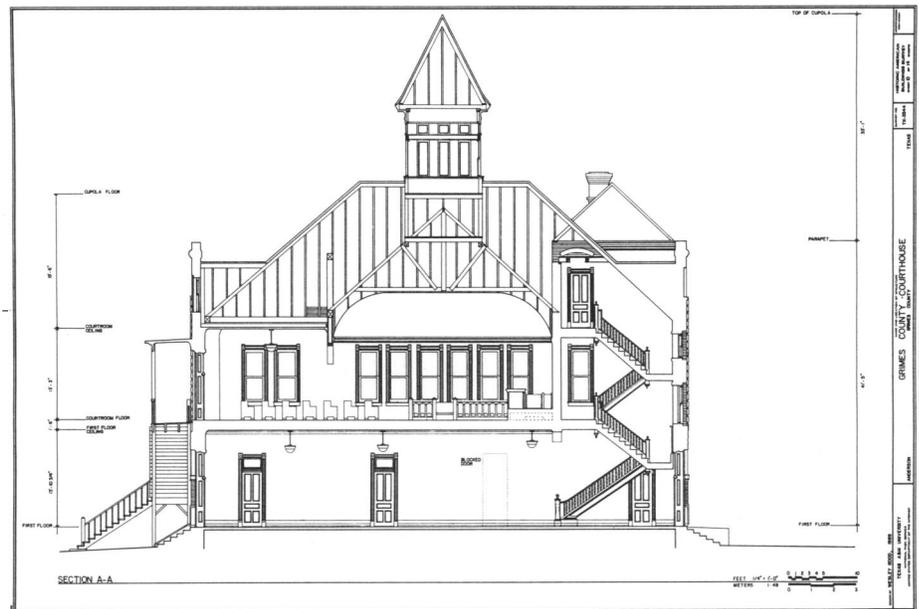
The Grimes County Courthouse was constructed in 1894, after fire had damaged earlier structures on the site. Placing the courtroom on the second floor allowed for clear spans, since there are no rooms above. The Victorian builders provided only one stair in the building, though an external wooden stair was added to the south side in the 1920s. Concern for life safety and accessibility is a major challenge that can only be addressed by the addition of a sprinkler system and an elevator, the latter causing a significant reduction in usable space. Documentation by Texas A & M University student team, summer 1989. HABS Collection, Library of Congress.
